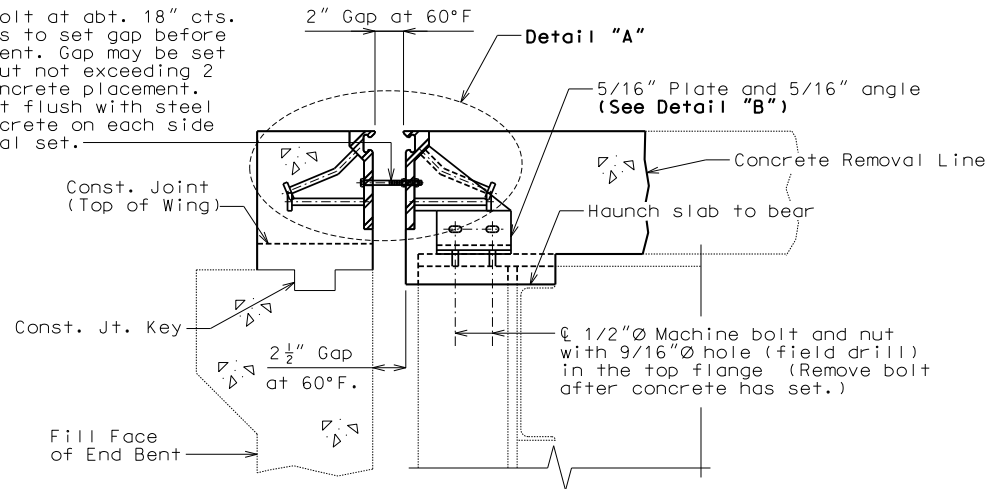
DETAILS OF SLAB AND BARRIER CURB AT JOINT 3 NEAR END BENT 10
